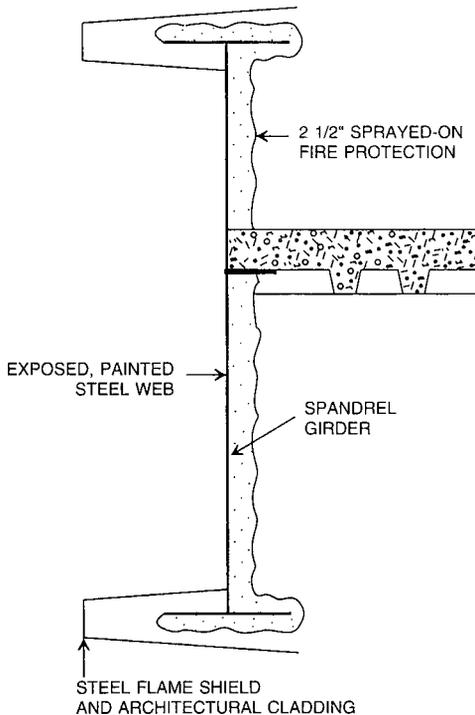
Flame shields placed on flanges of a spandrel girder to protect the web against flames.
